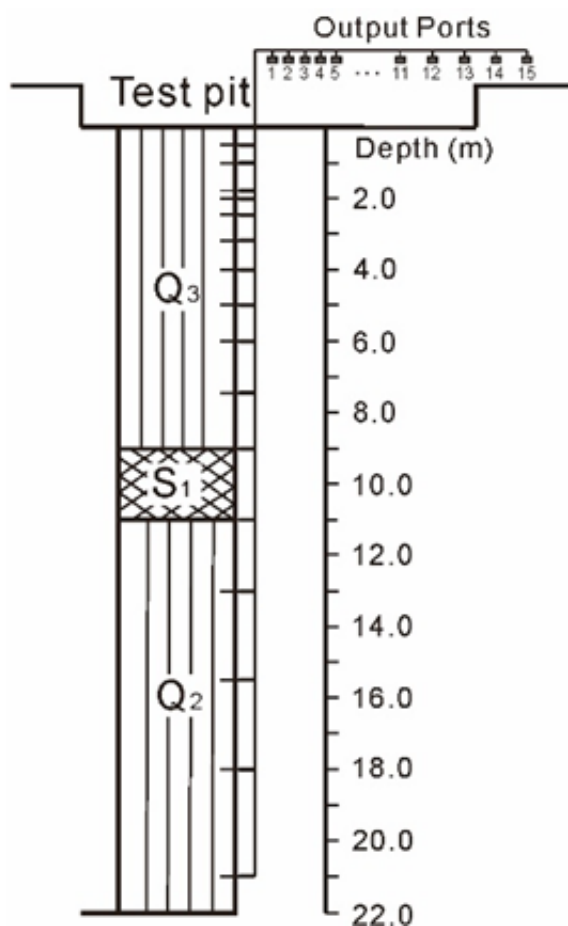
Arrangement of the water meters in TJ1 well at Qingcheng site.
